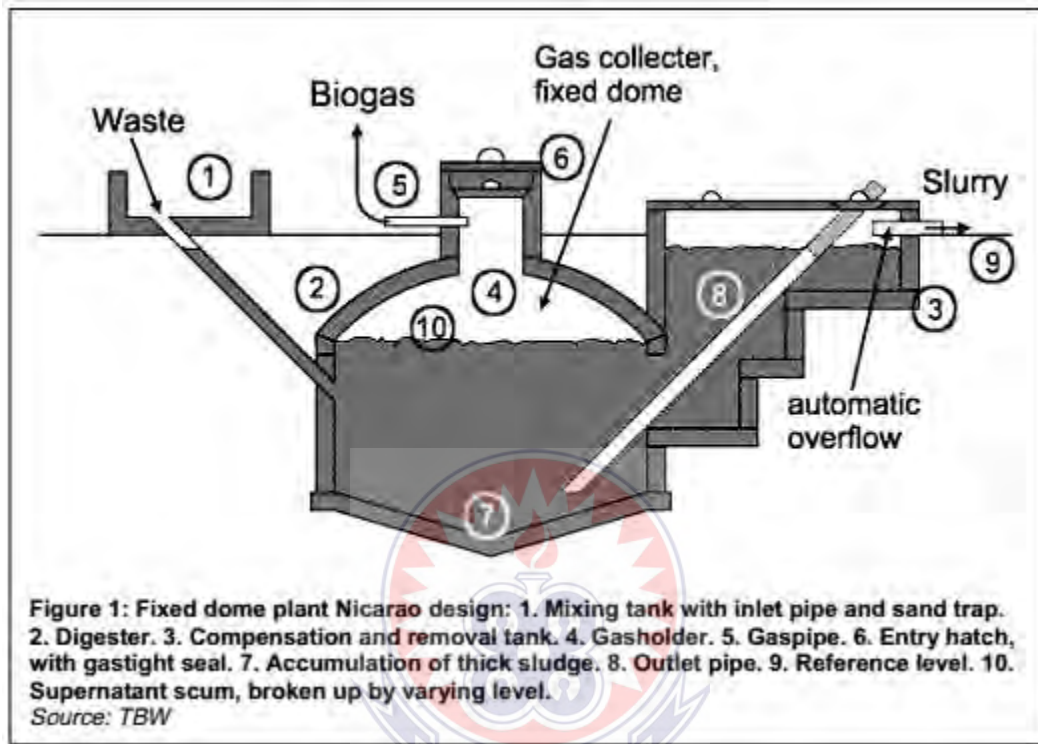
Schematic layout of a typical biogas plant (Fixed dome plant Nicarao design)
